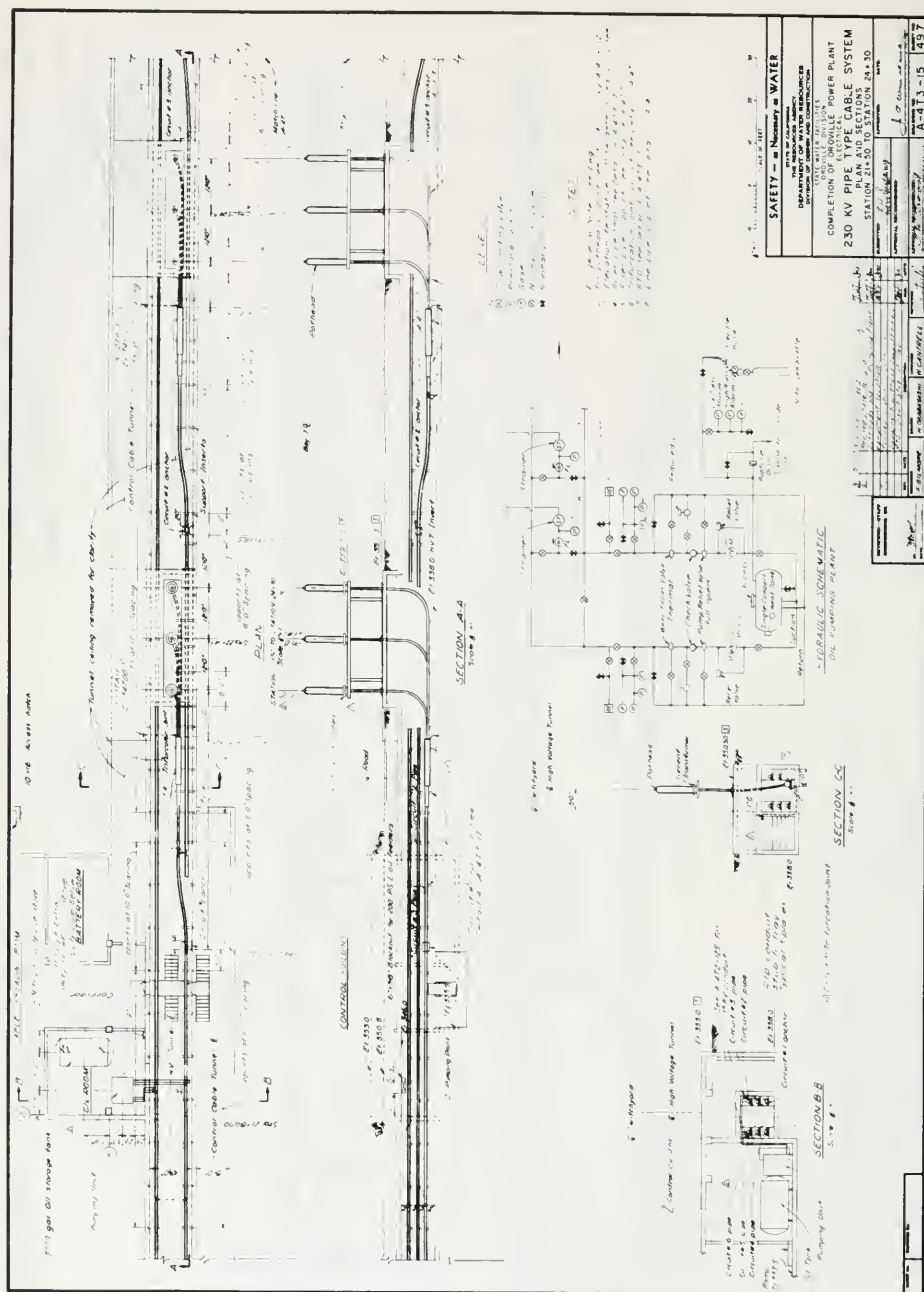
230-kV Pipe Cable—Plan and Sections—Different Location
